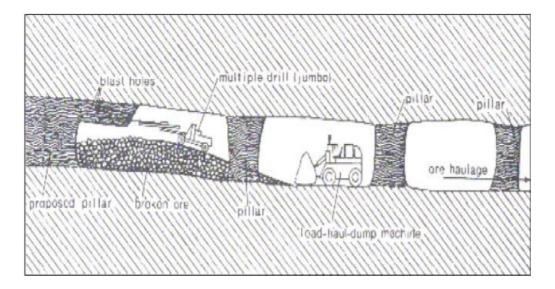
Cross section of typical bord-and-pillar layout (Source: Scoble, 1993)
